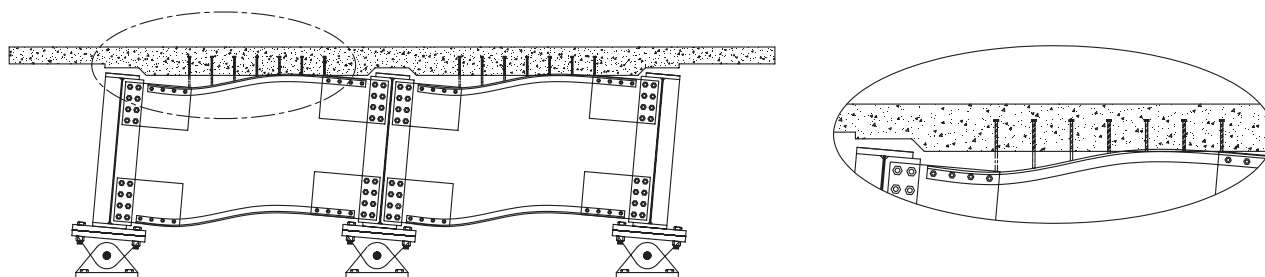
Specimen F0B: (a) deformed shape of subassembly; (b) close-up of deformation at deck-top chord connection.
